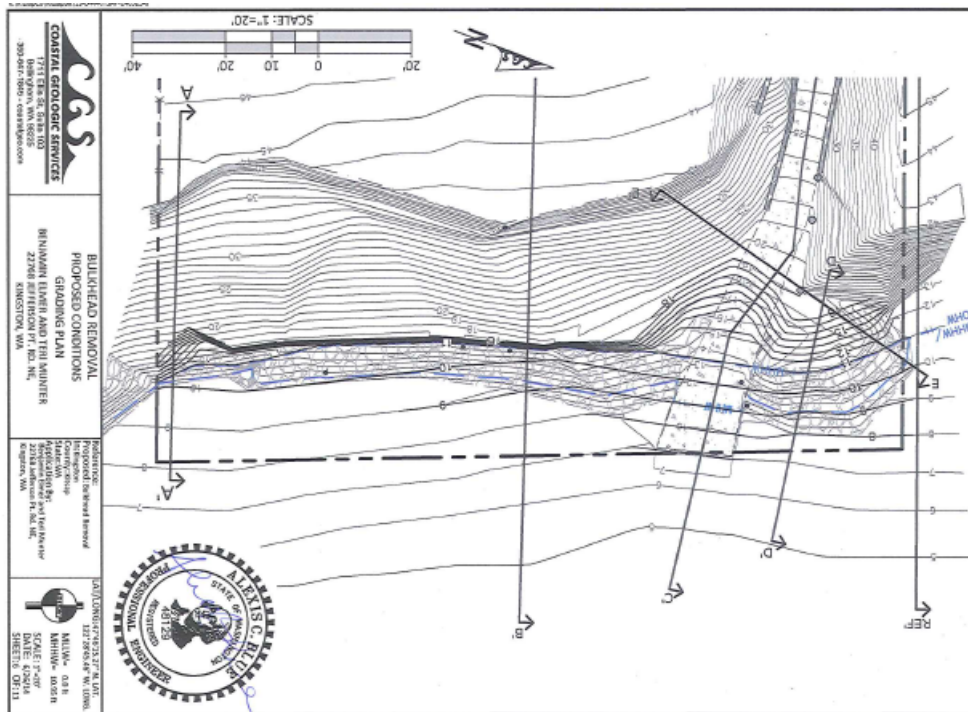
CLOSE-UP OF BULKHEAD TO BE REMOVED. SITE PLAN SHOWS ANTICIPATED NEW OHWM.
